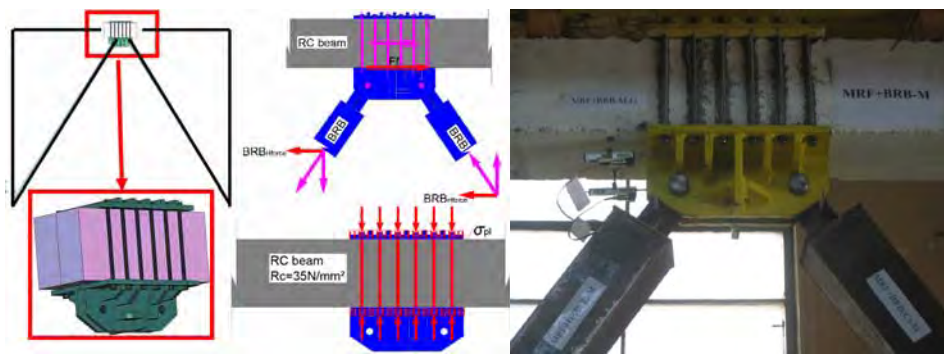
Beam – brace connection: pressure under the steel plate due to bolts pre-stressing
